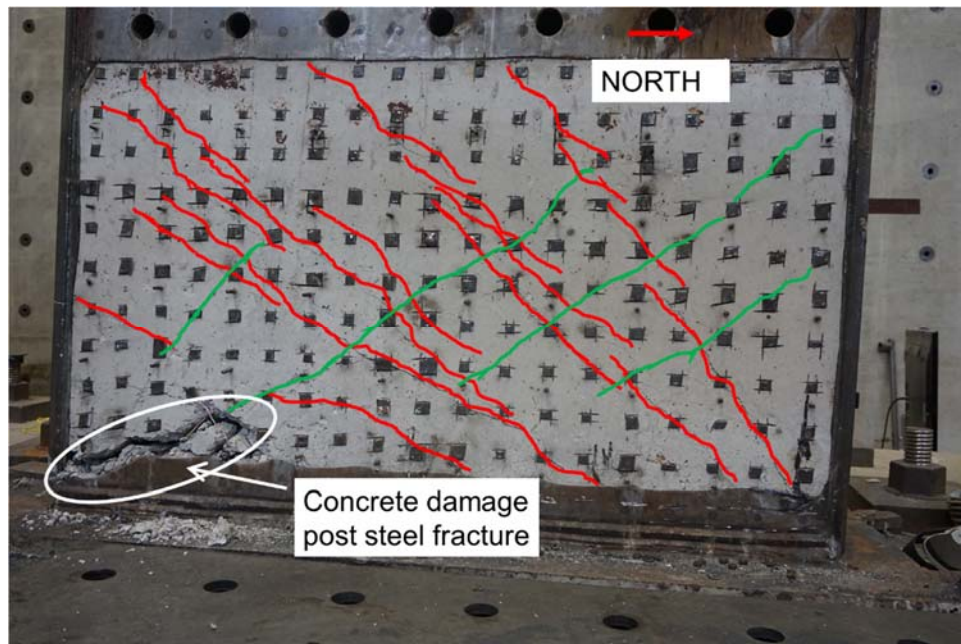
SC-W-H: Concrete cracking and damage at failure (faceplate removed)
